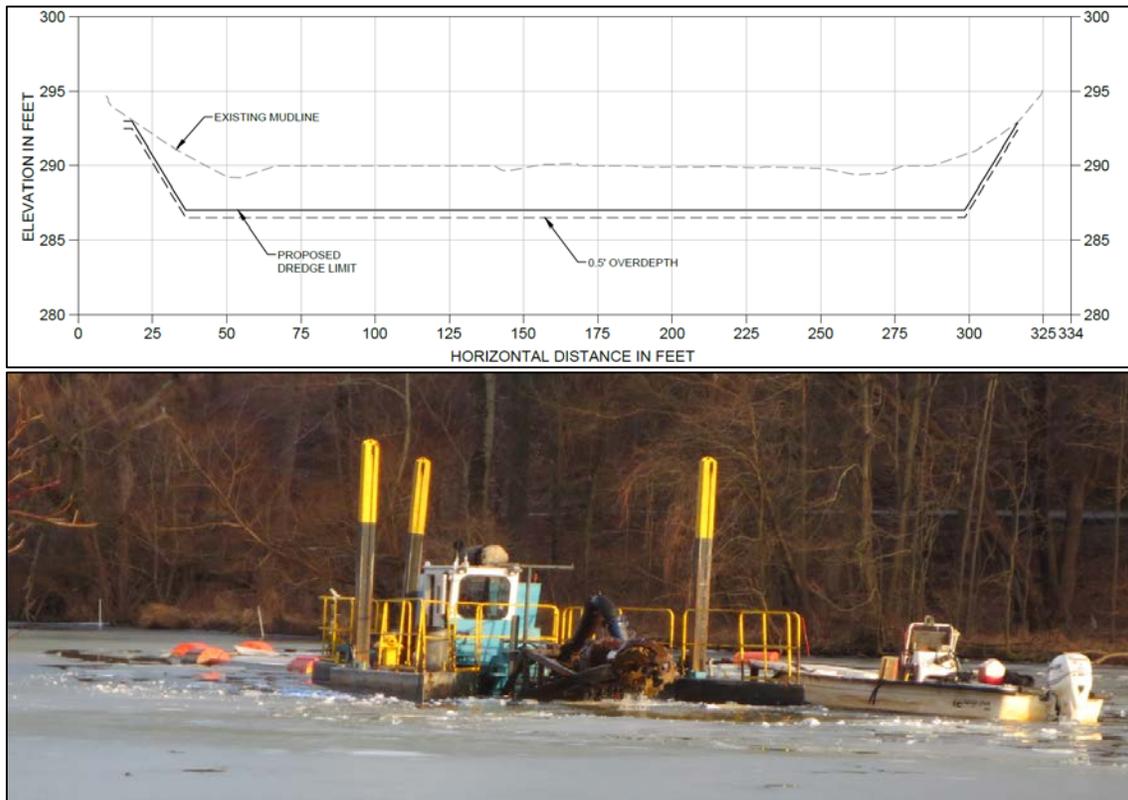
Lake Elkhorn Dredging Section and Construction Photo
